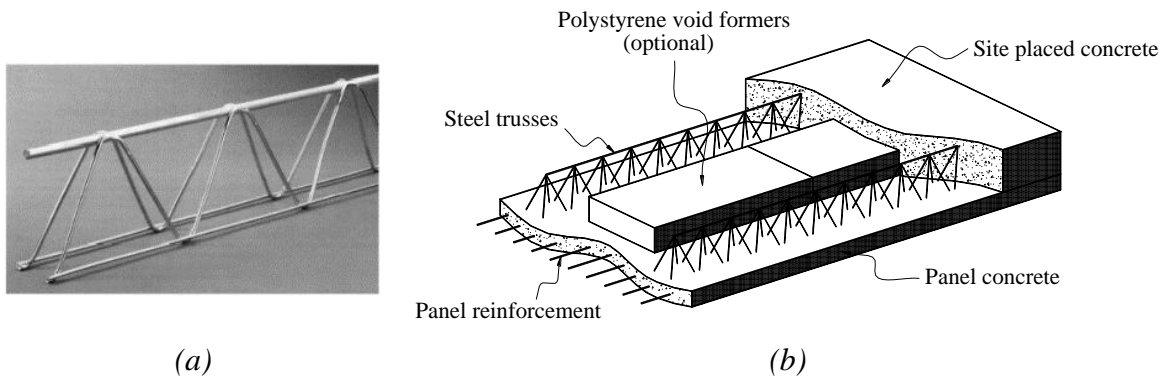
(a) A lattice girder truss (a) and a lattice girder element (b).
